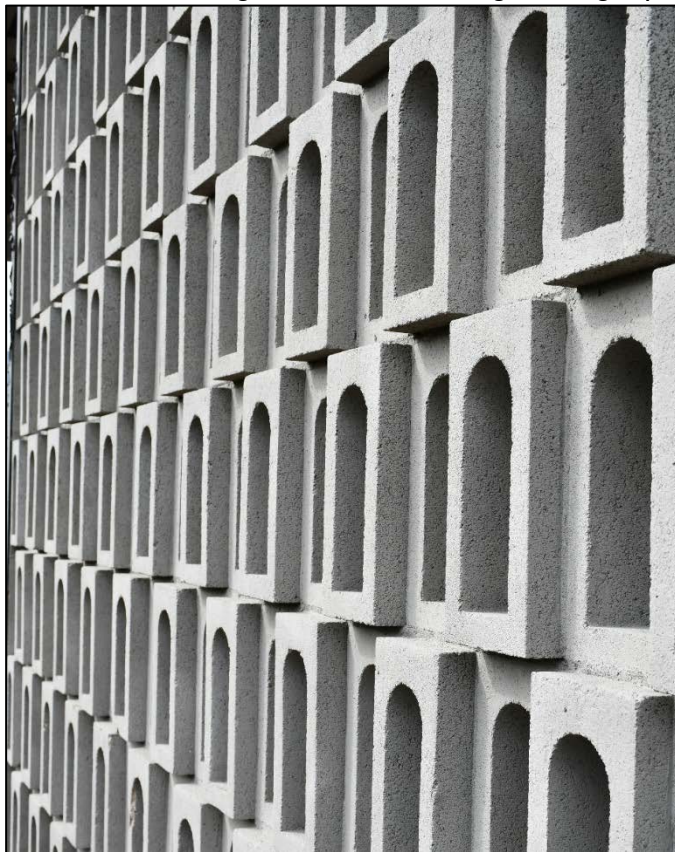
of 25: Decorative concrete blocks at terrace, camera facing southwest
